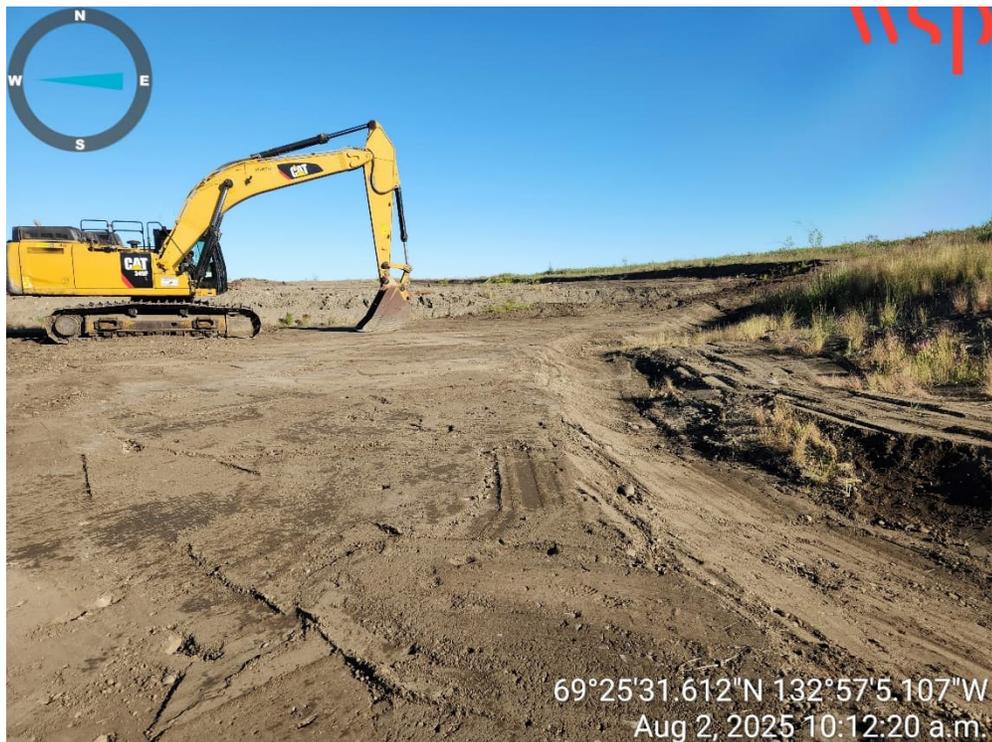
CAT 349 excavator completing sloping away from the swale outside of the southeast corner of the South Landfill (2 August 2025).
